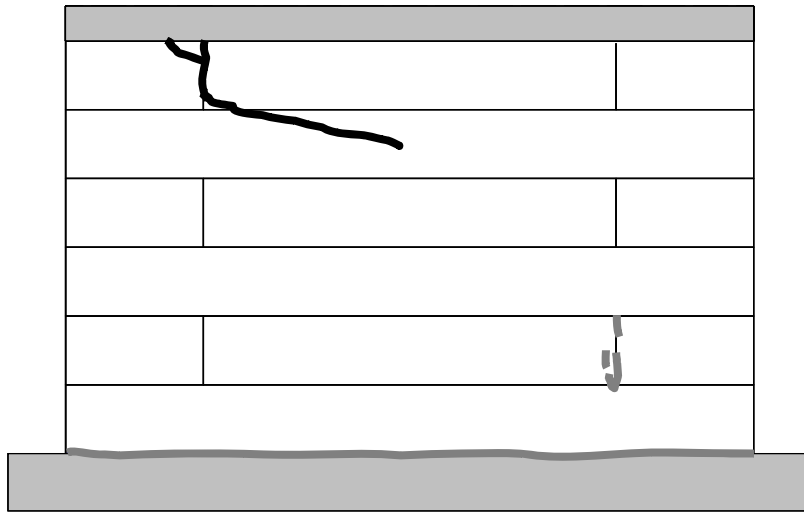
Cracking of Shear Wall Pilot Specimen 2 at Cycle 12a (head-joint shear cracking in top course)
